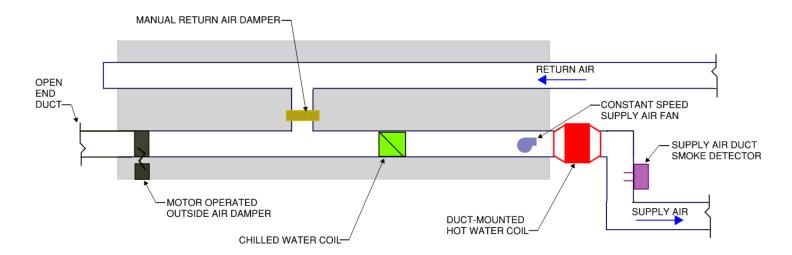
Existing Central Station Air Handling Unit Features (Not to Scale)
